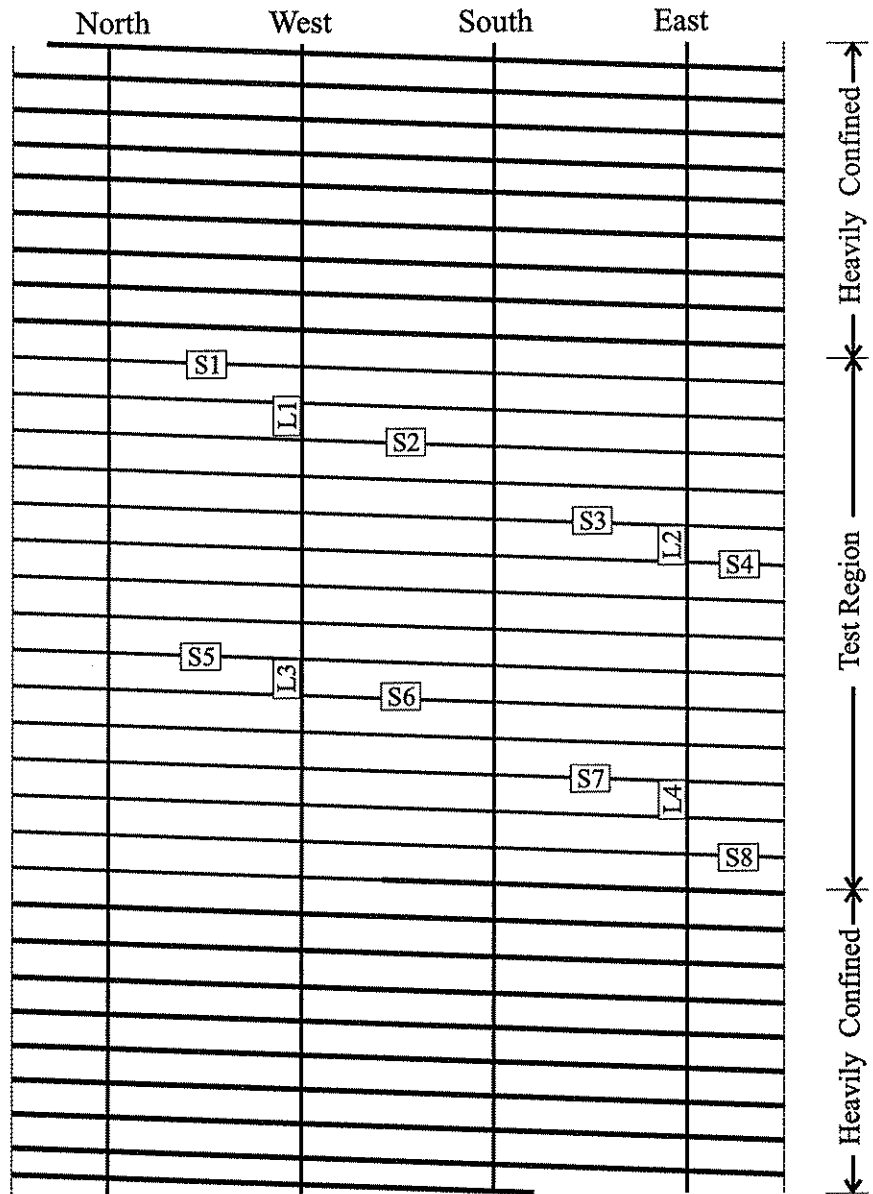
Typical 14 in. diameter pile reinforcing cage showing general layout of strain gages.
